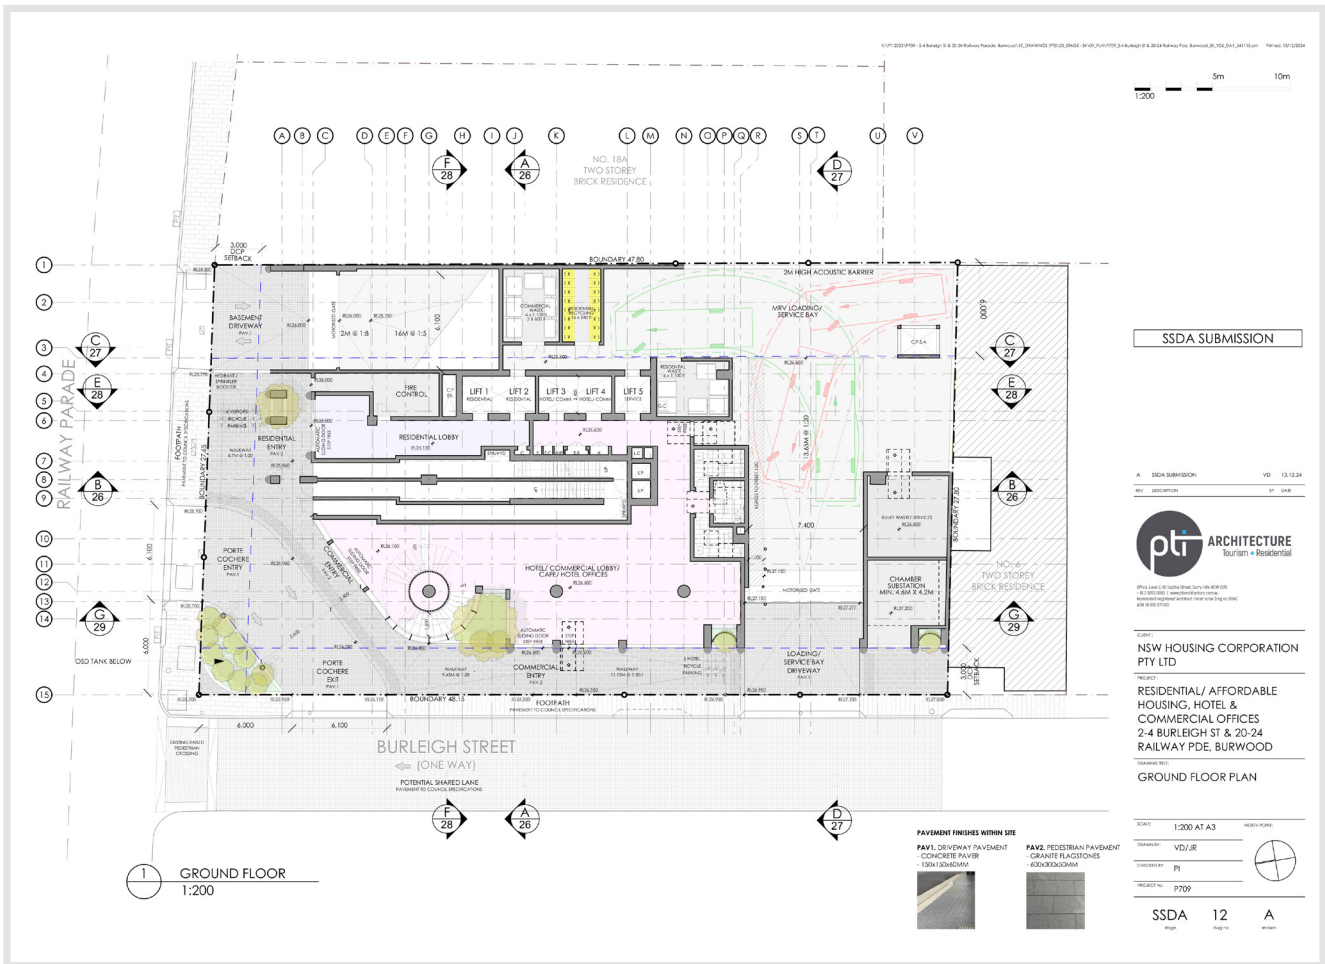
Typical floor plan of the proposed design by PTI Architecture.
